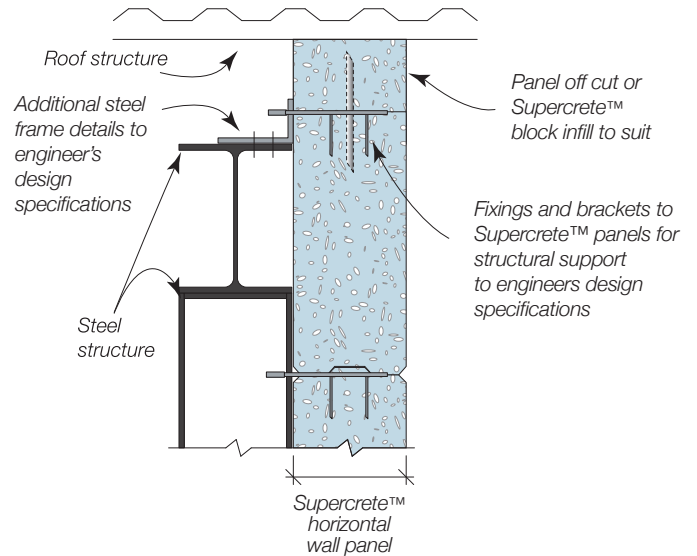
Horizontal wall panel & steel edge support - panel ends junction detail. Option 1.
